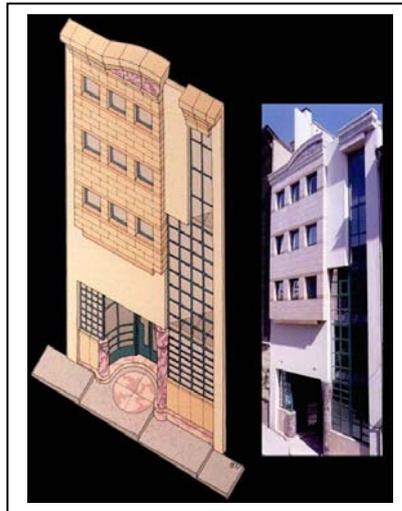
Advertisement House, Office Building, Nişantaşı,
